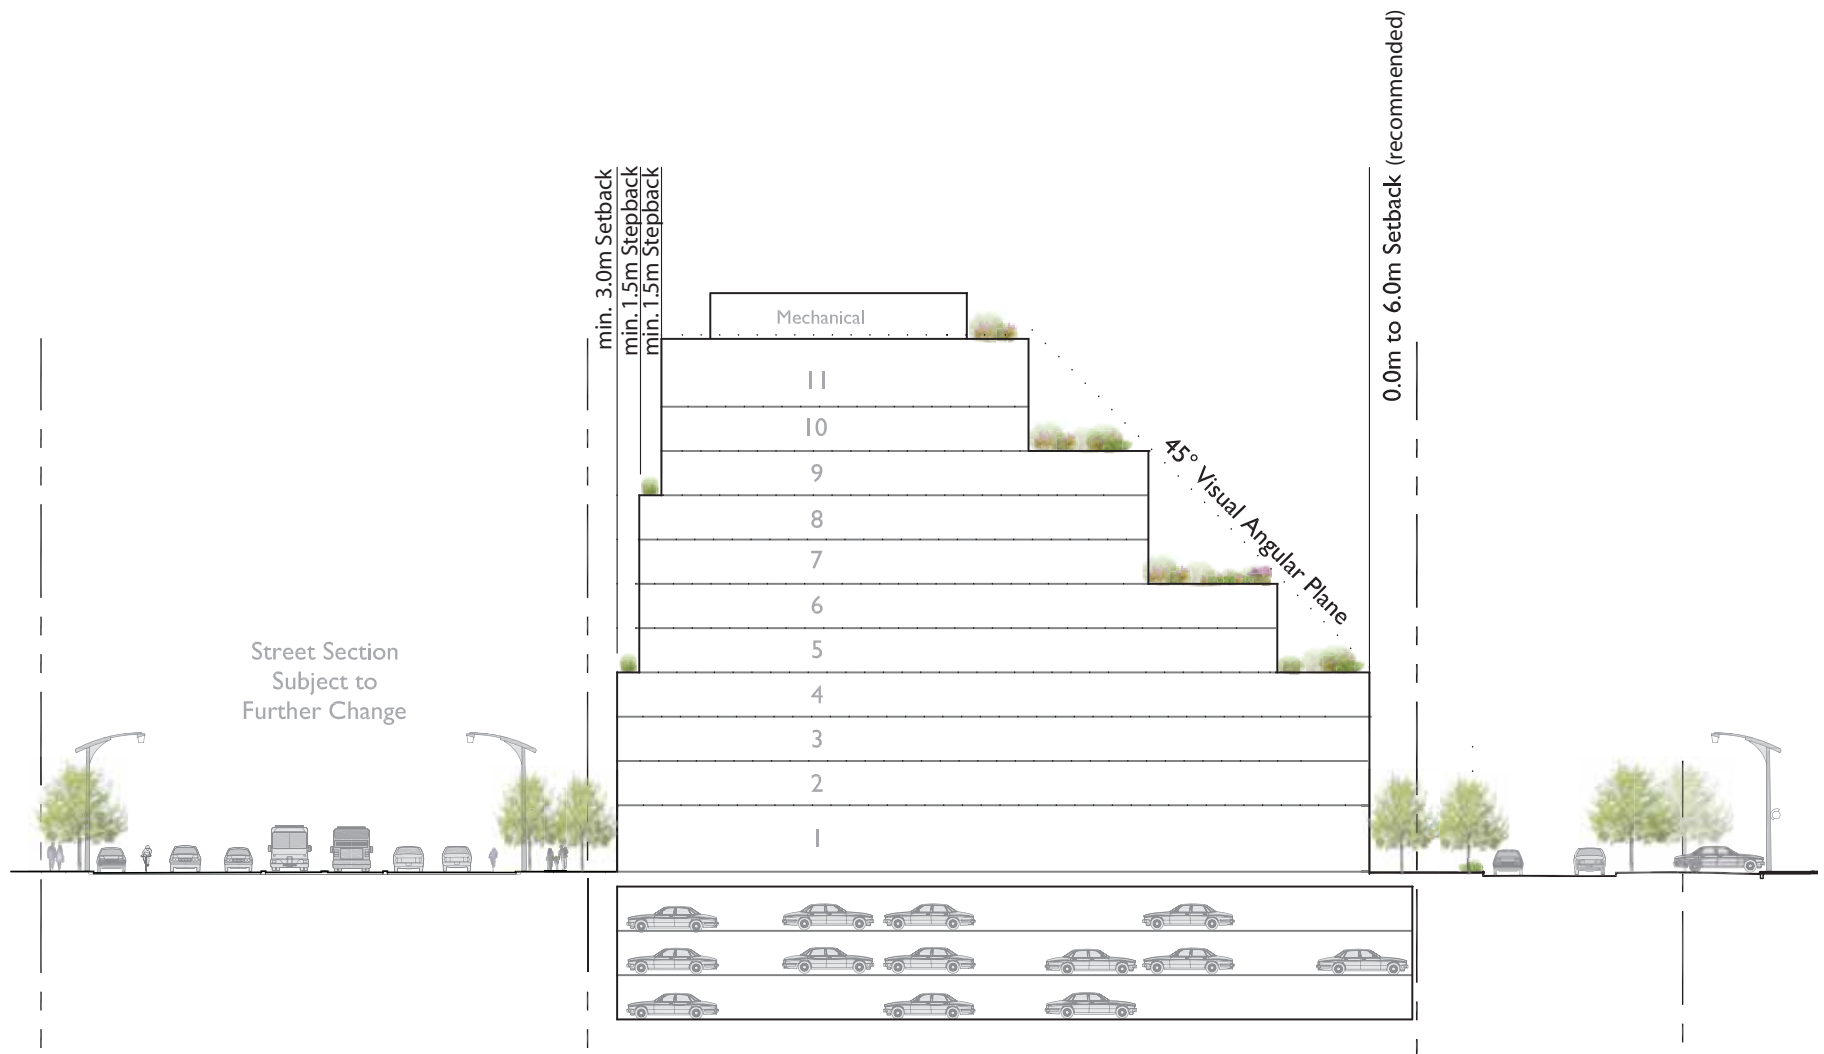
Recommended Typical South Side Building Envelope (Mid-block)
